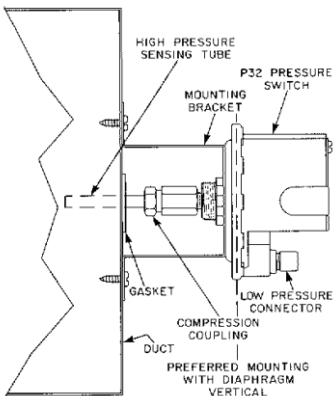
Typical installation for a P32 Switch on duct using Part No. BKT229-1R bracket and direct mounting probe.
